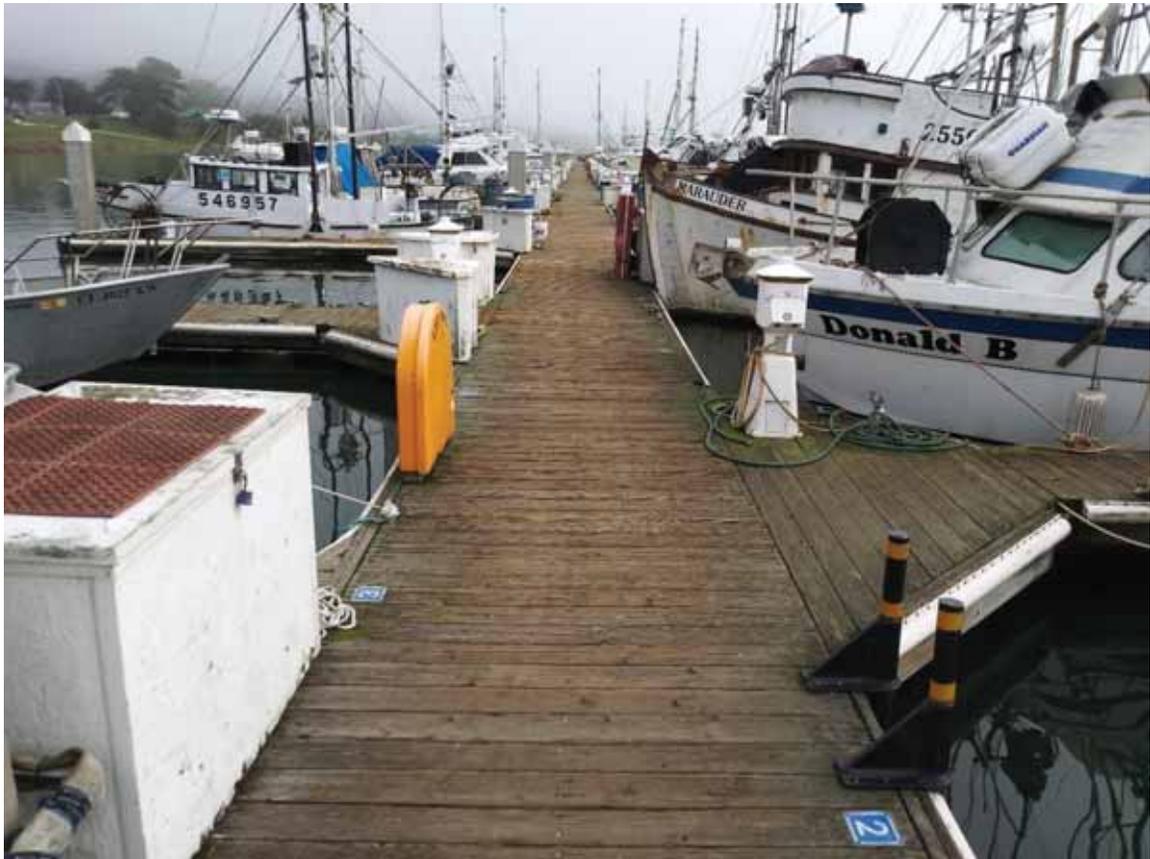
Fueling dock attached to Johnson Pier, Facing Northeast
